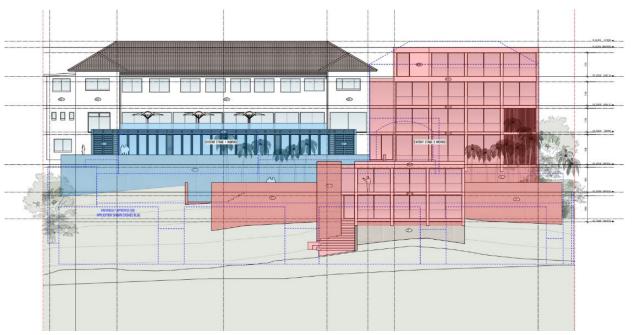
East elevation showing proposed Stage 1 (blue) and 2 (pink) works as well as extent of works approved in 2013 (blue dashed line).
